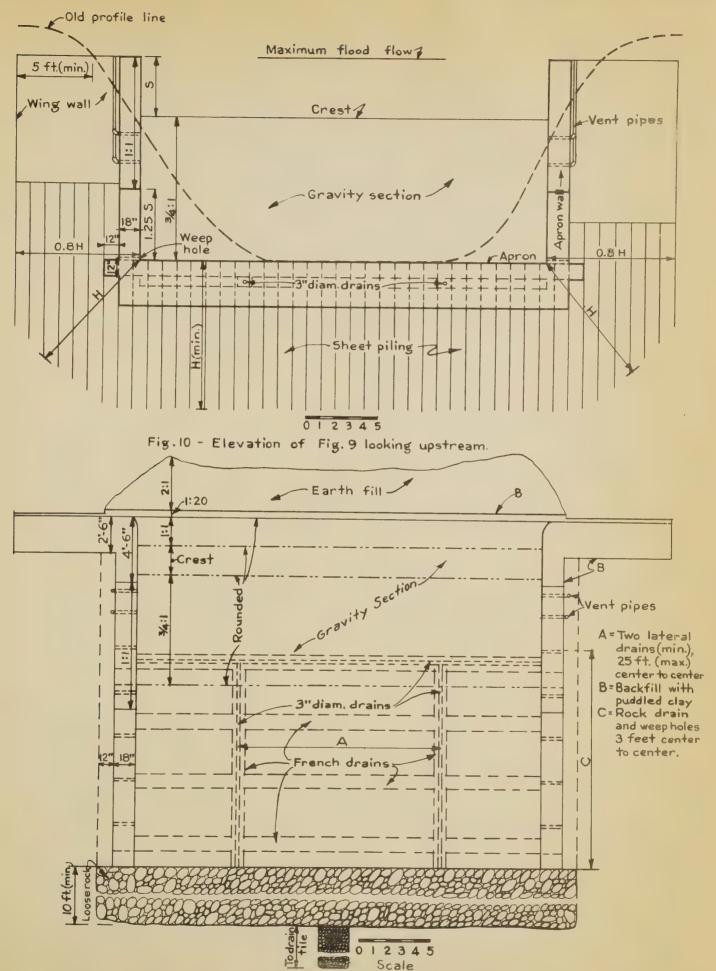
Plan of Fig. 9 rubble masonry overflow dam.
